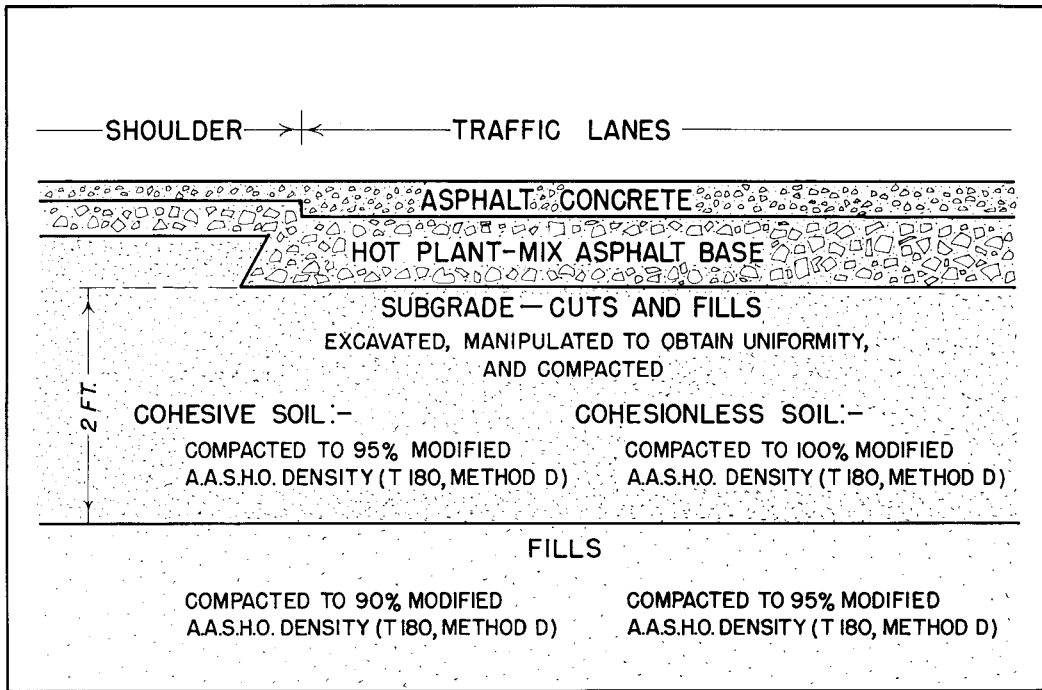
FIG.II SUGGESTED ASPHALT PAVEMENT CROSS SECTION.
